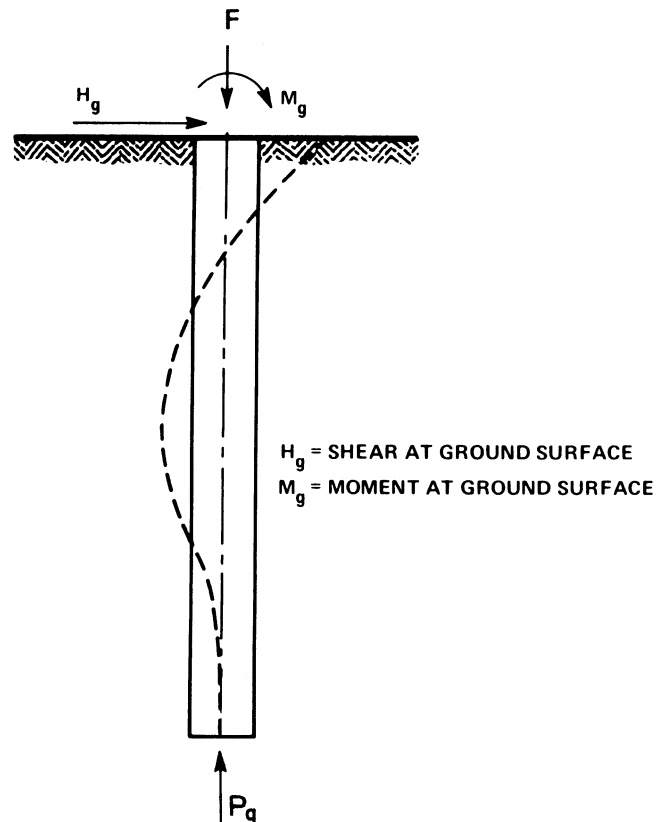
Flexible type pier (after Davisson [1969], with notation altered).
